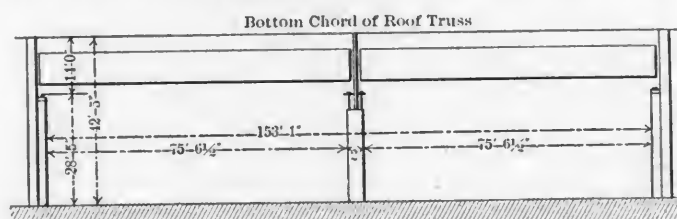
CROSS SECTION OF ERECTING SHOP. BALDWIN LOCOMOTIVE WORKS.
